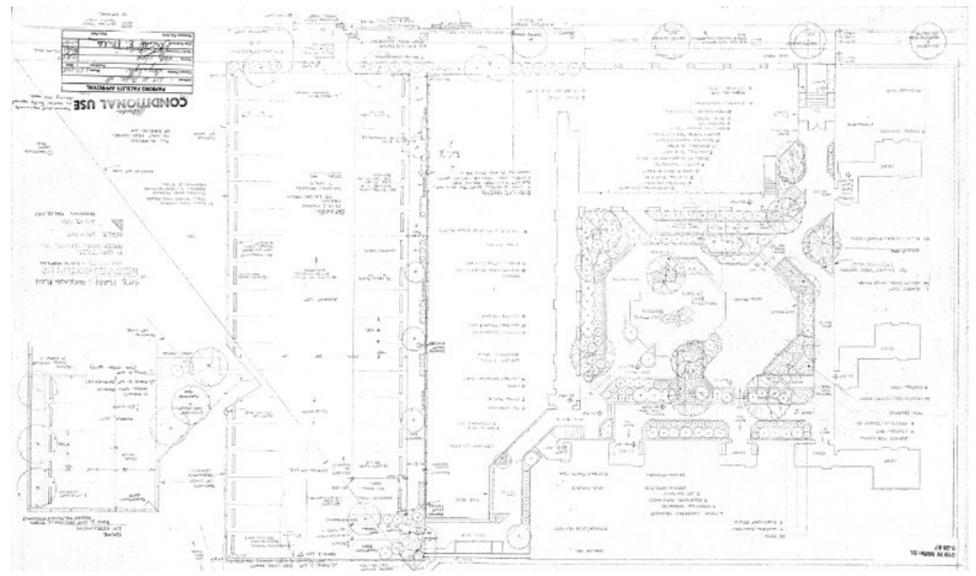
September 8, 1987 site plan for Conditional Use application to create a structured parking area on what was originally intended to be a surface parking lot. City of Madison Building Inspection Files, Madison, WI.
